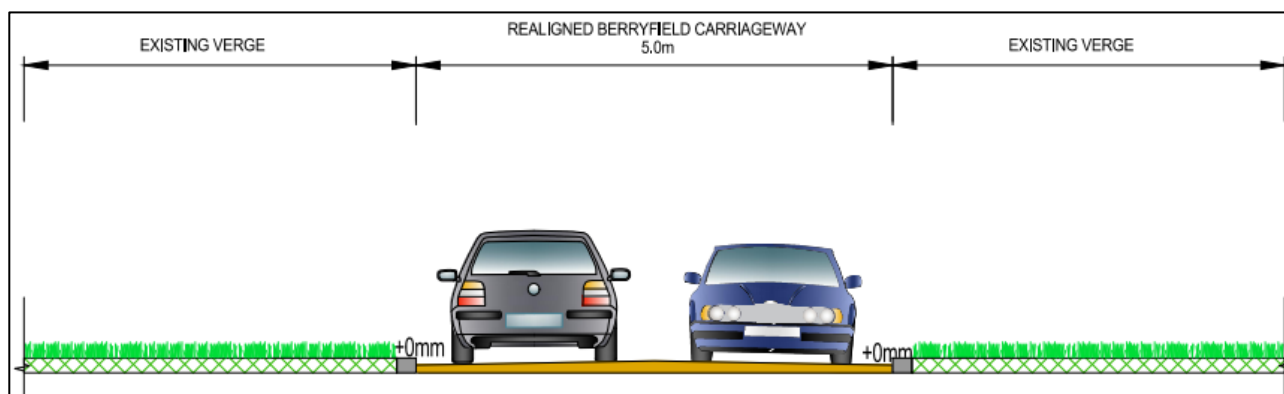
Typical Cross Section of Berryfield Lane (Existing)
